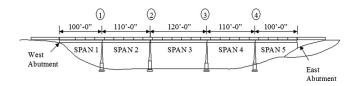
Elevation of Schoharie Creek Bridge (WJE/MRCE 1987)
